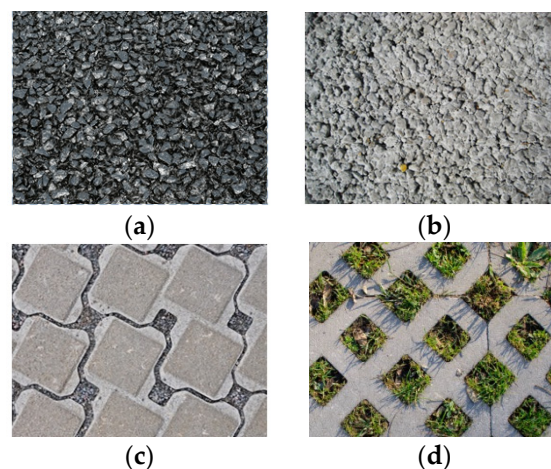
Different types of PP: (a) porous asphalt (PA); (b) pervious concrete (PC); (c) permeable interlocking concrete pavement (PICP); (d) grid pavement (CGP if in concrete or PGP if in plastic).
